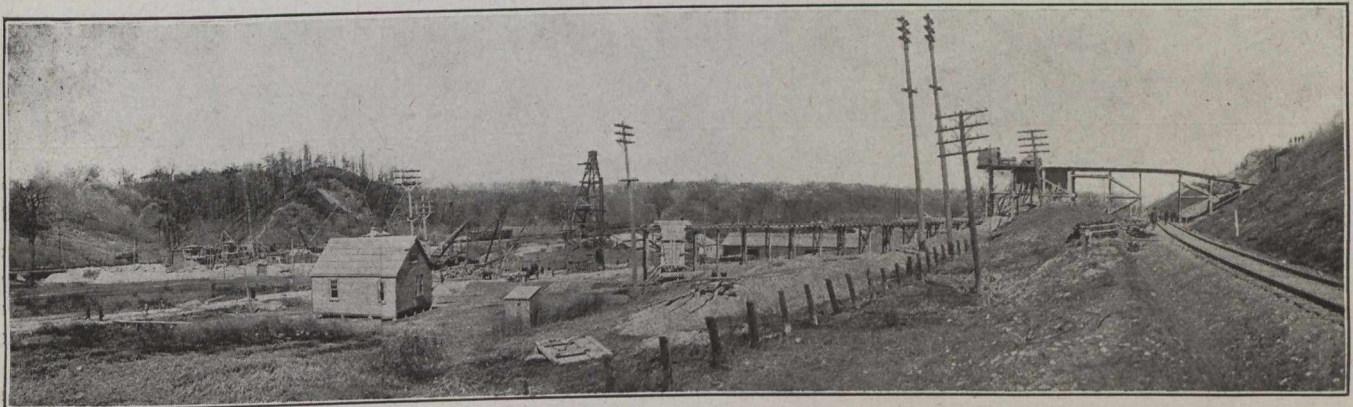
The Site of the Don Section in April, 1915. Sheet Piling is Being Driven for Pier Foundations.
